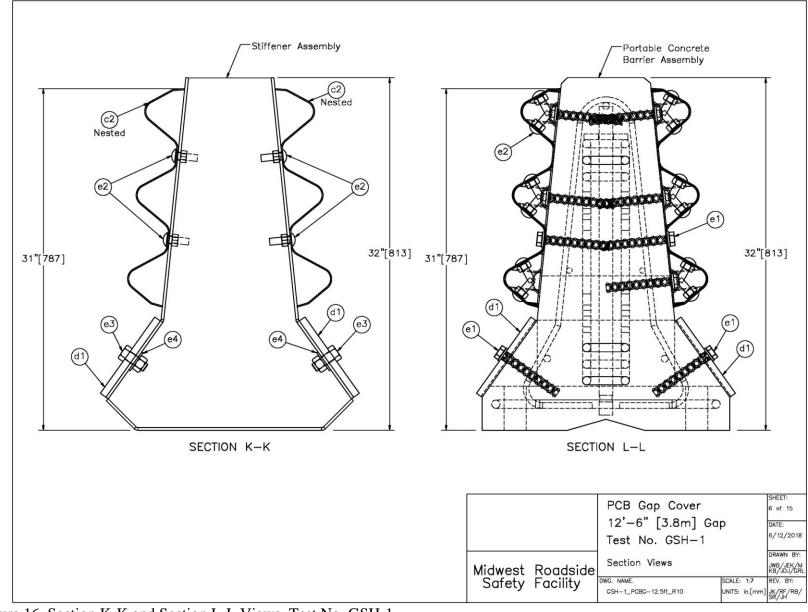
Section K-K and Section L-L Views, Test No. GSH-1
